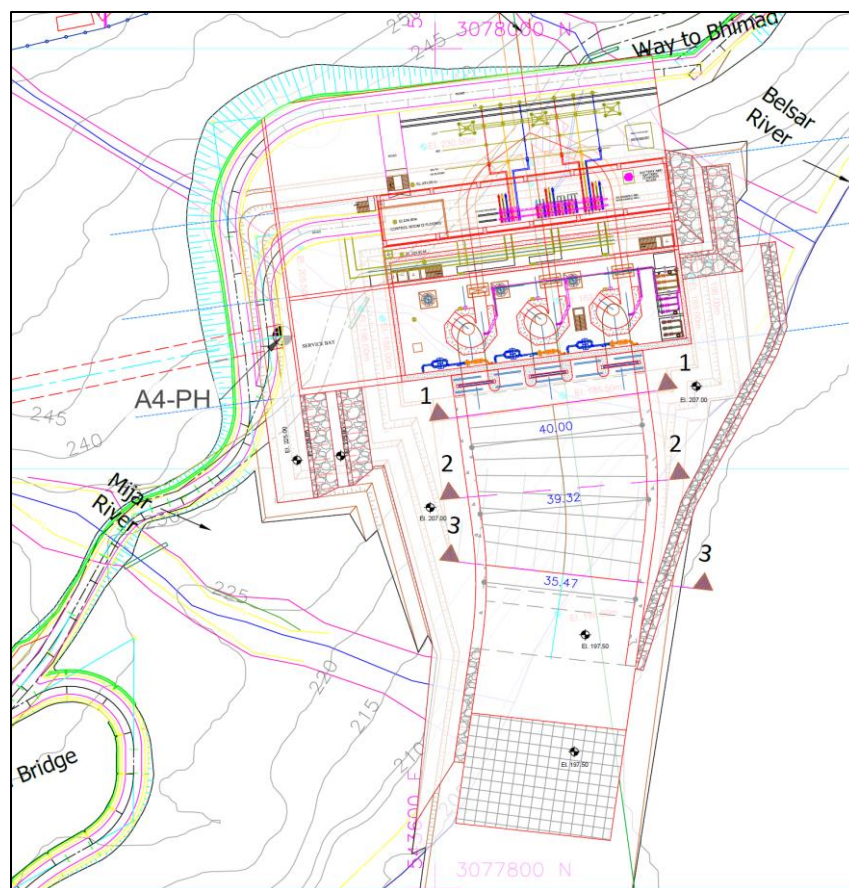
Layout of Powerhouse (Source: Detail Design Report, 2021)
